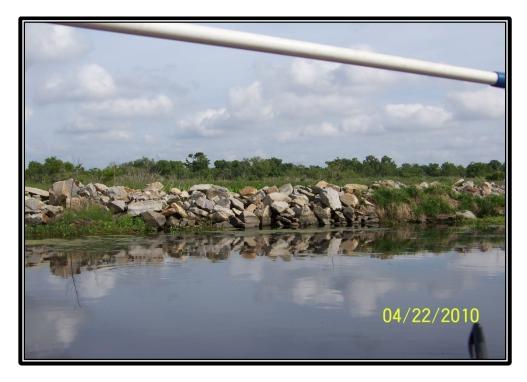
rock breach closure "Breach 7" installed in 2003 along an existing location Canal off of Superior Canal looking northeast.
